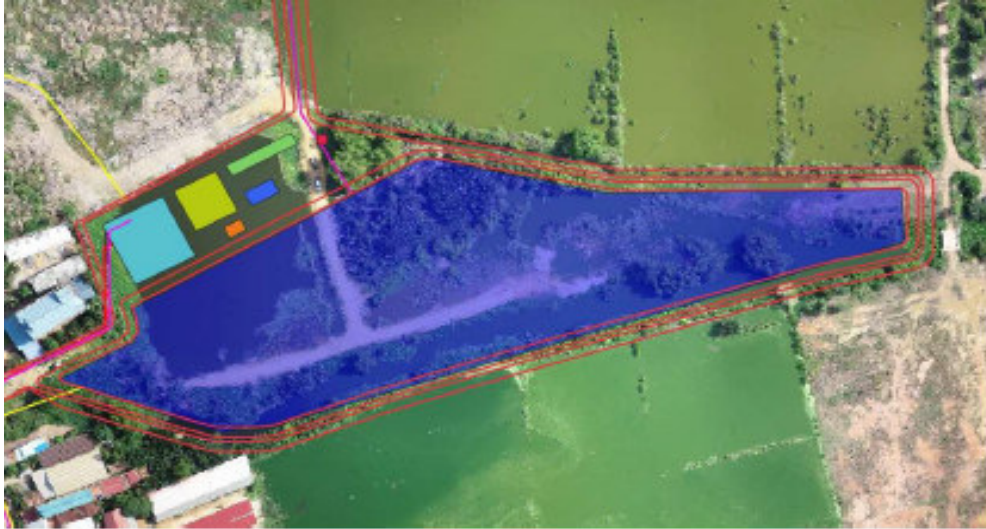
The location of the proposed 2.9 ha main pumping station where the proposed additional works are proposed.
